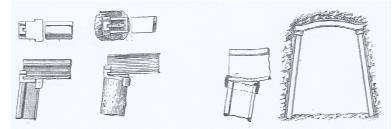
Prop and cross bar connection details. Z-type roller profile joint- Germany, 19th/20th century [4]
